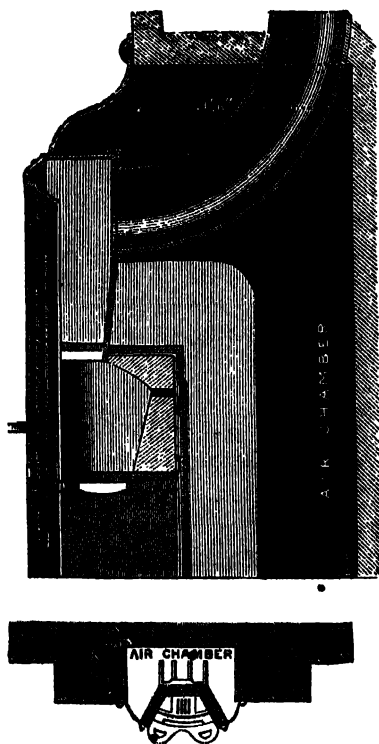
Section and plan of Sir Douglas Galton's grate.
